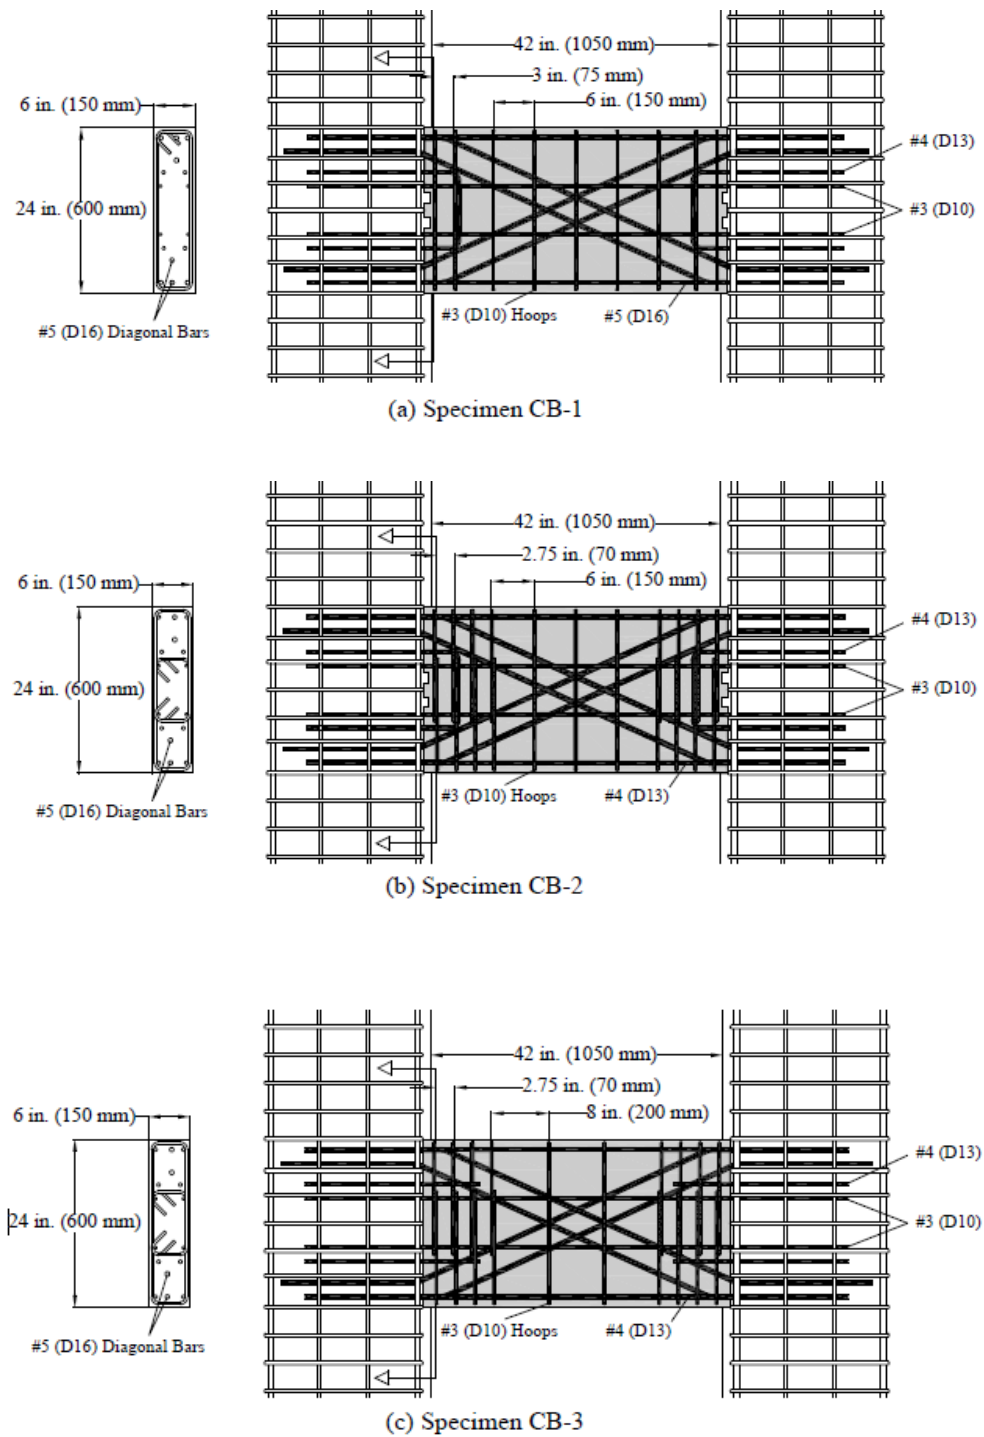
Reinforcement layouts for HPFRC coupling beams (Lequesne et al., 2010)
